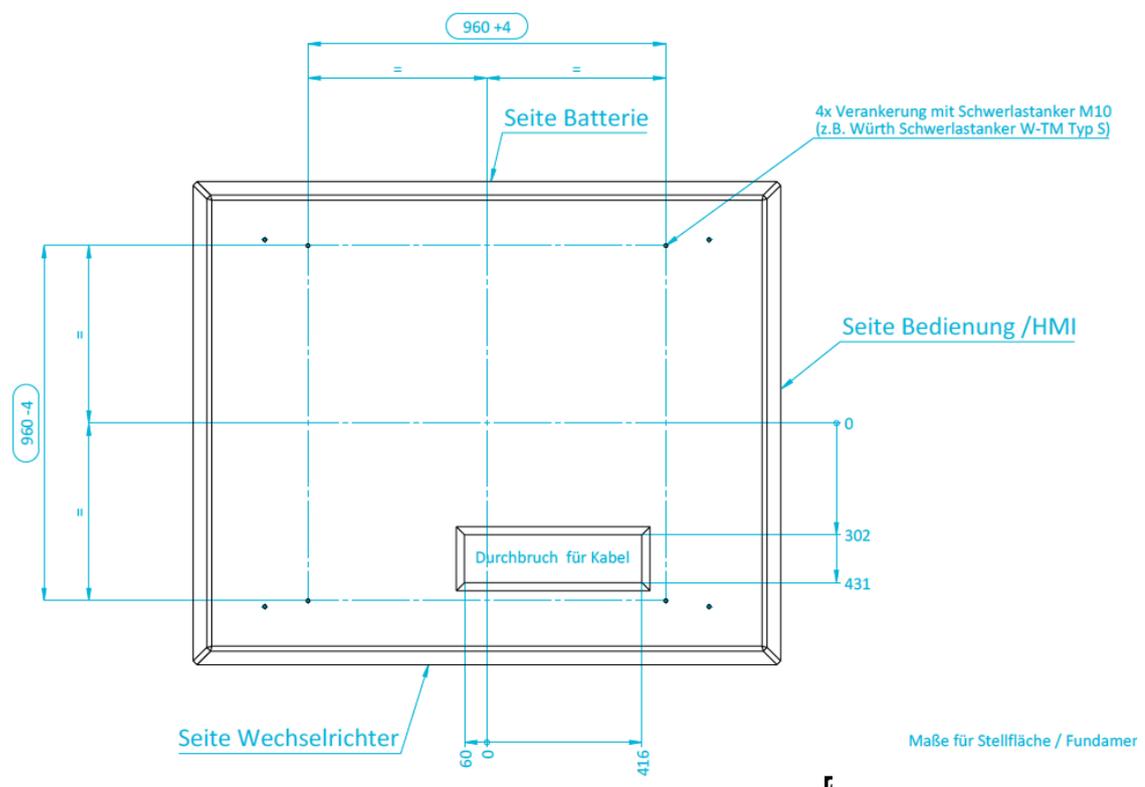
DIMENSIONS FOR SCREW CONNECTION TO FLOOR SPACE/FOUNDATION (DETAIL FROM CONSTRUCTION DRAWING)
